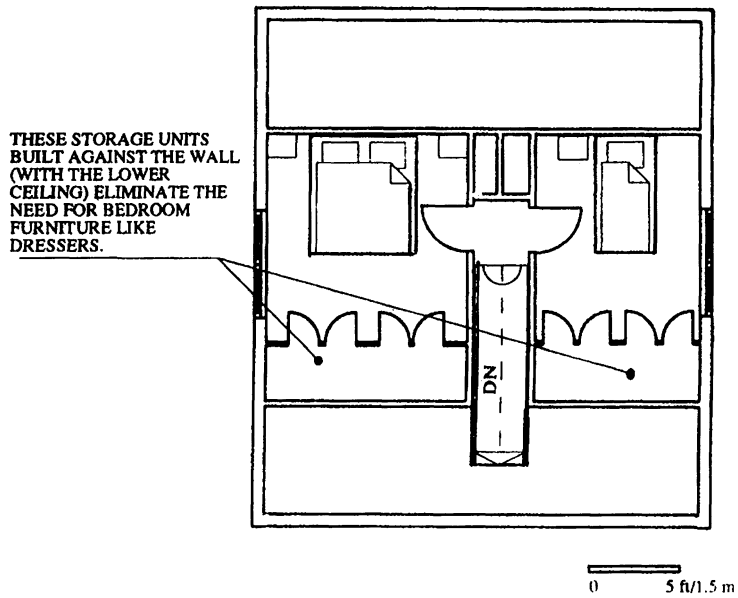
Upper-floor plan of case study 24: Attic bedroom storage units.
